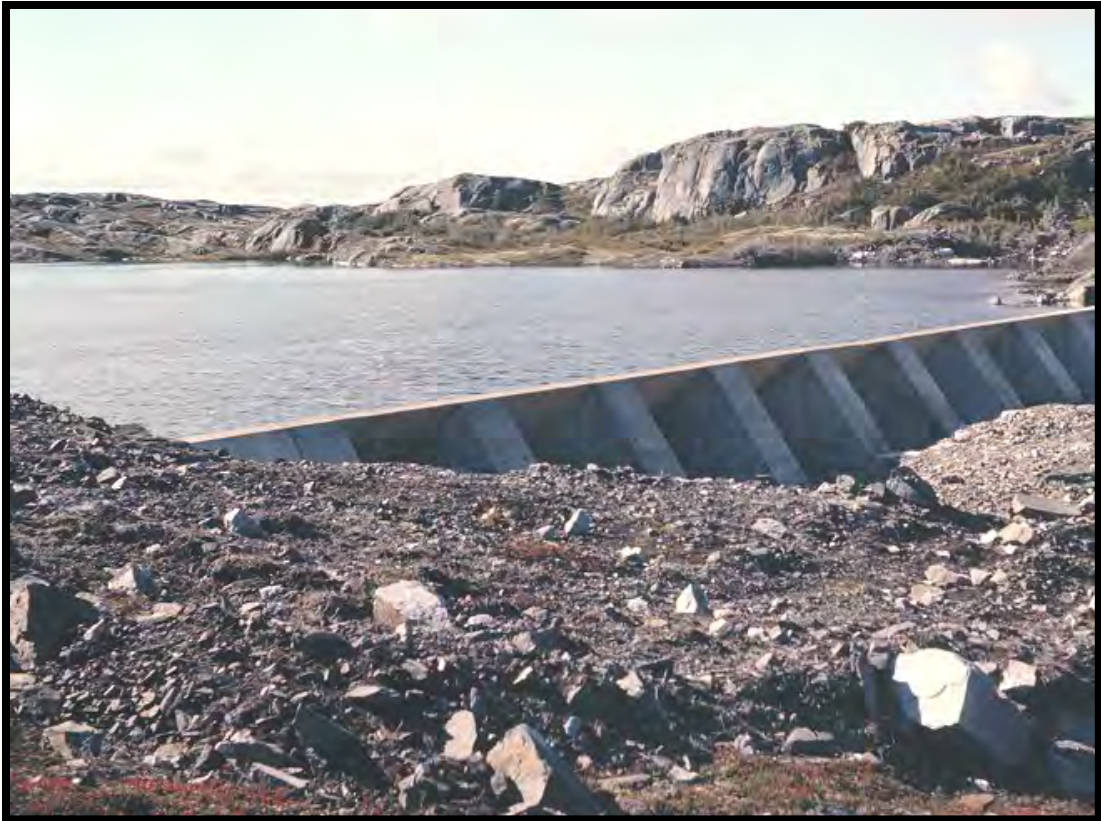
View looking north, towards the pumphouse Site dam for the water supply - July 1959.
